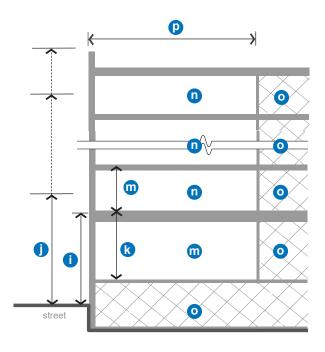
(F)(2) Civic Building: Height and Use Requirements
